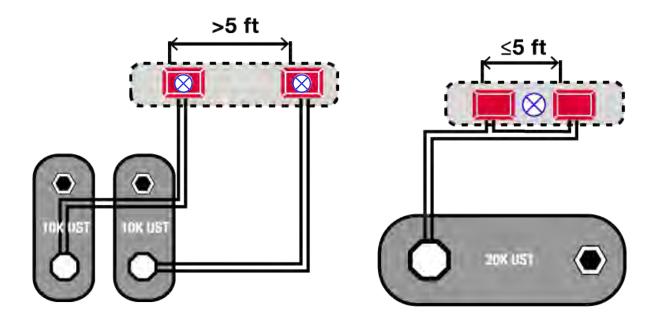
Cross sectional view of sampling locations for a piping trench, with multiple pipes greater than five feet apart.
